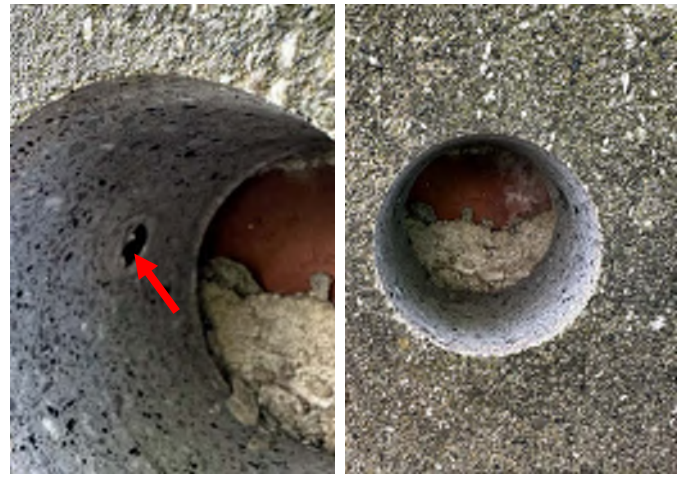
Closer views of the previous image show a low steel reinforcing tube and brick masonry backup.
